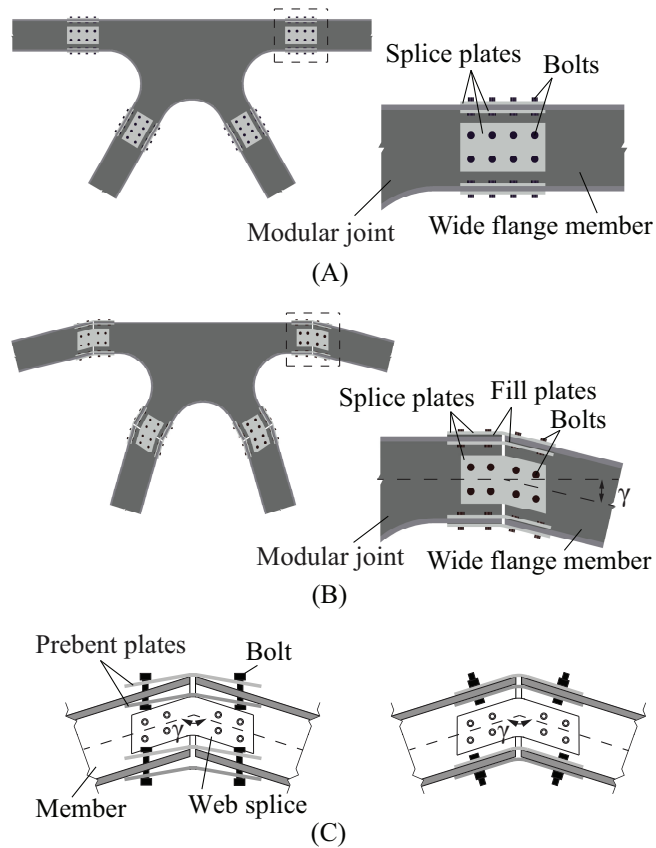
Connection between modular joints and members: (A) Via straight splice plates, (B) Via adjustable bolted steel plate connection, and (C) Field installation of the adjustable steel plate connection by bolt tightening: untightened (left) and final tightened (right) state [(C) adapted from Gerbo et al. (2019, 2020a), ©ASCE].
